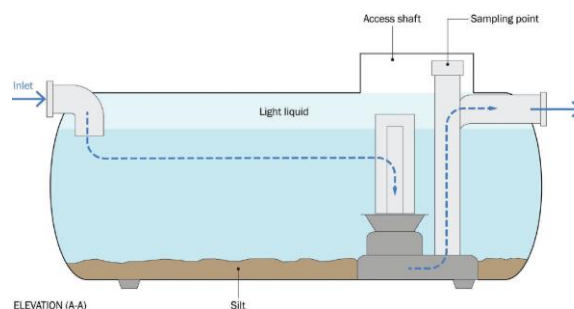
Typical Section Detail of Fuel Separator (CIRIA C753)
